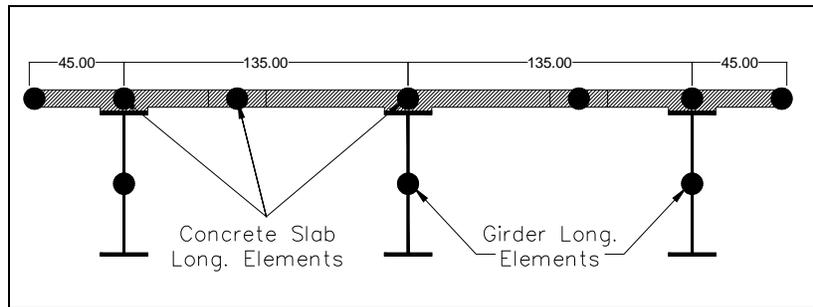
Bridge cross section with the locations of the longitudinal elements used in the analytical models
